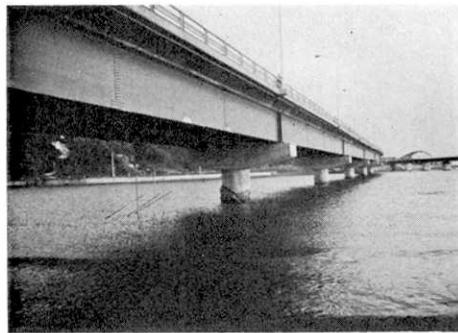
Damaged No. 3 pier of Shizunai road bridge.
